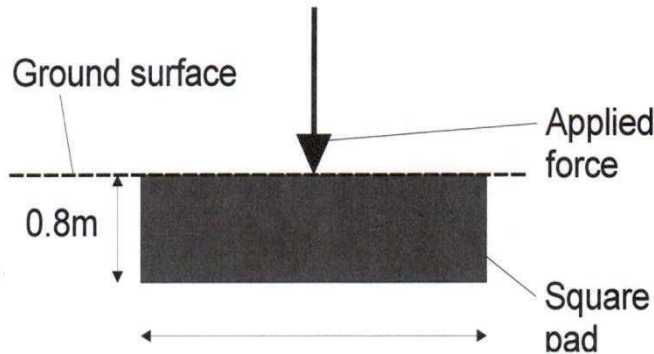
Example 2.1 Pad foundation on dense sand design situation
